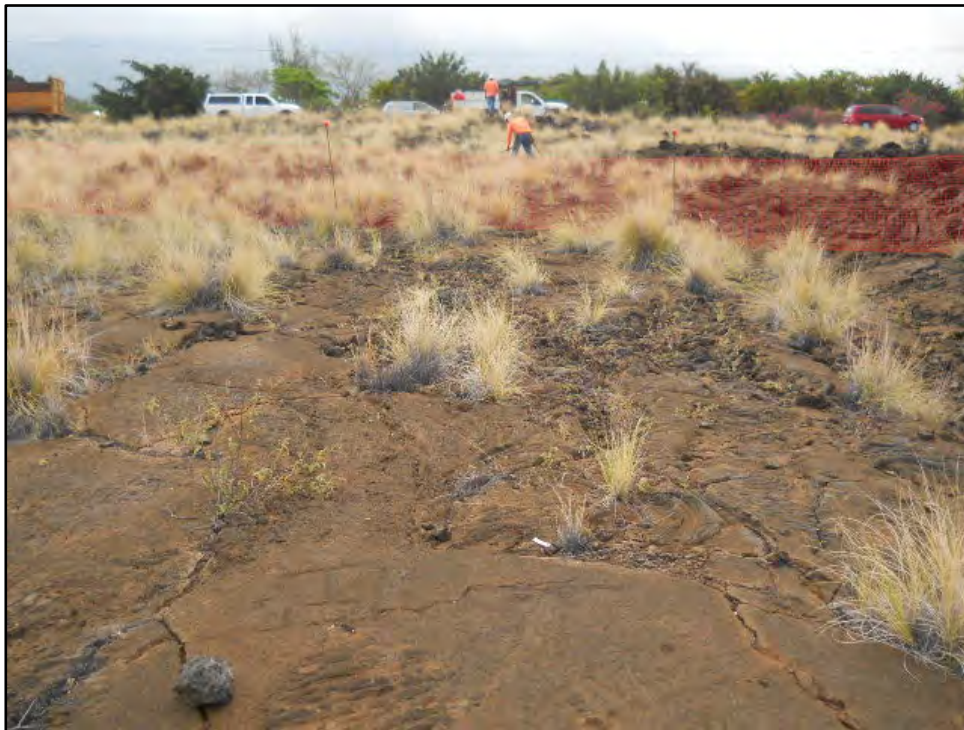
Photo of interim fencing installed at SIHP # -19945 on 26 May 2015; view to northeast
